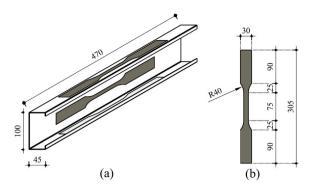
Cold-formed steel coupon specimens: (a) areas of coupon extraction, (b) coupon dimensions (unit - mm) [27].
